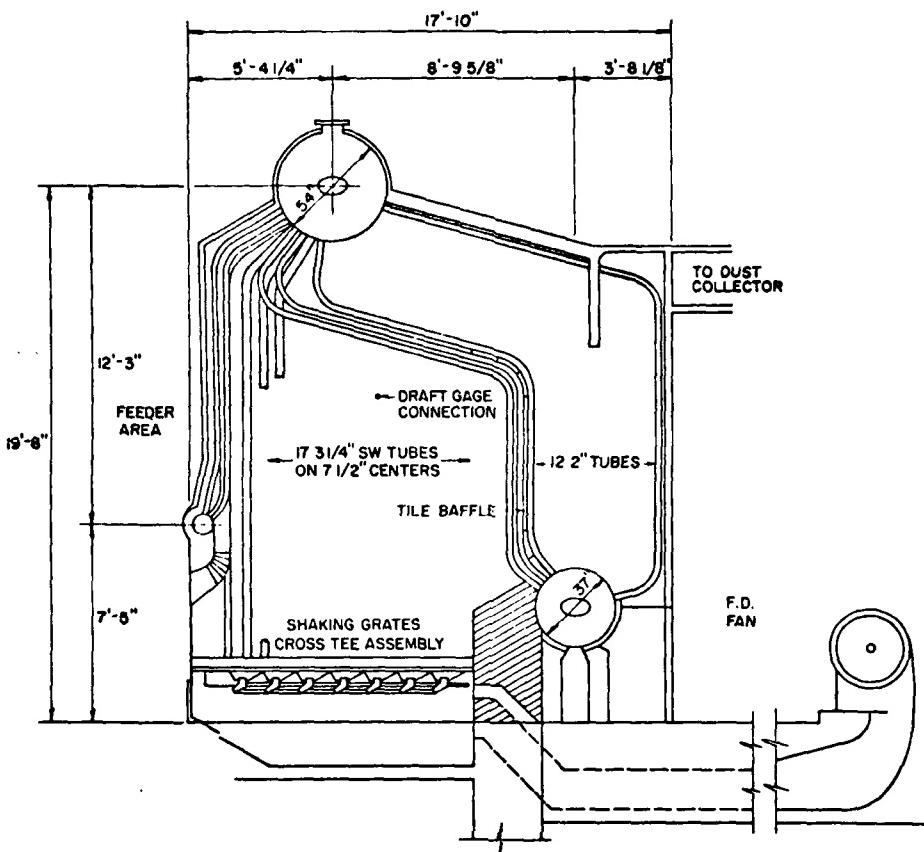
Boiler tested at Fort Benjamin Harrison, IN.
